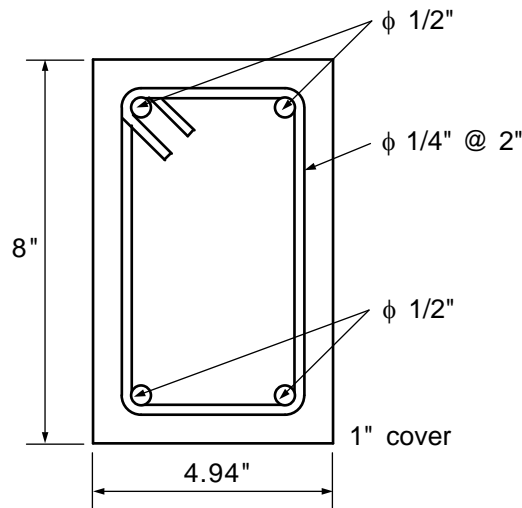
Beam Geometry and Reinforcement (adapted from 4-15)
